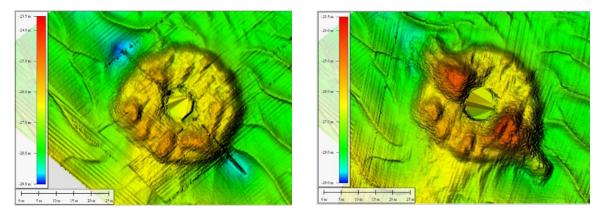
Survey images of an example WTG scour protection pad before (left) and after (right) rock placement.
